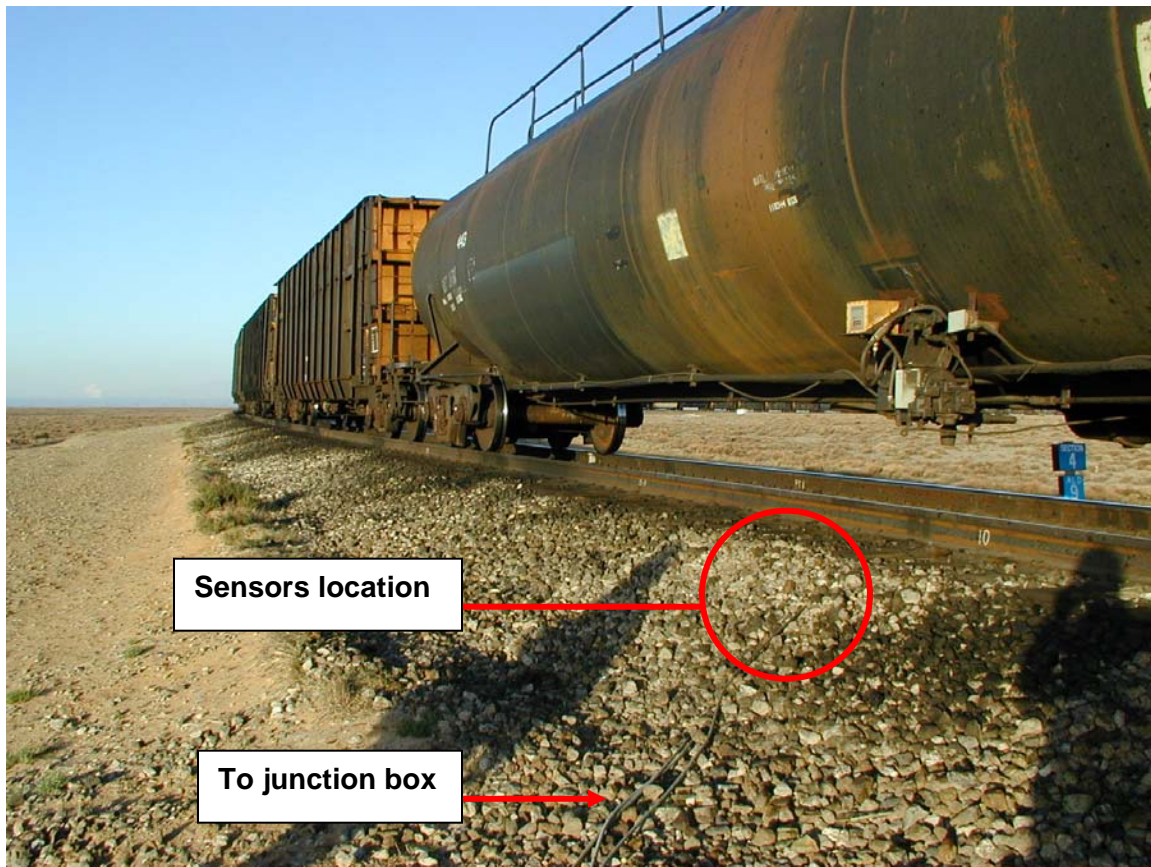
Picture of the sensors after the installation is completed. The BX cables runs out from the side of the ballast.
